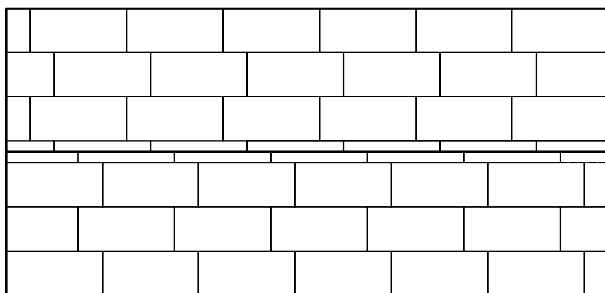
Roof Deck Sheathing Layout for House Model 0011G
